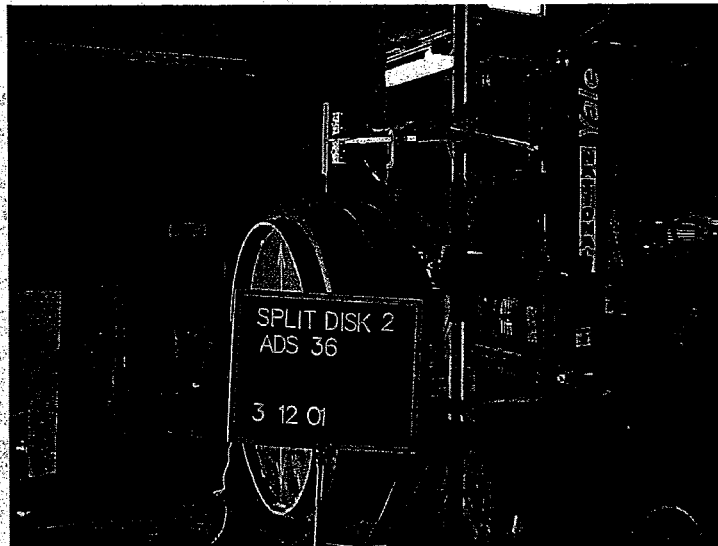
Overall Configuration of the Test Fixture for Testing the 36" Diameter Pipe
